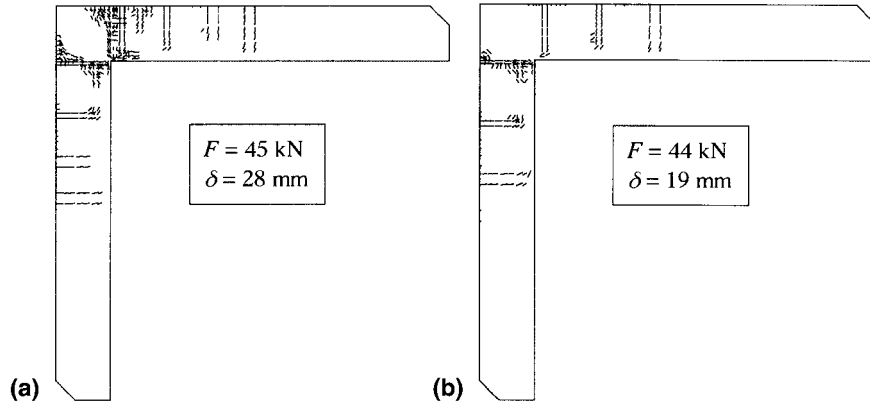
Crack Pattern at End of Analyses for Frame Corner with New Reinforcement Detailing When Assuming Two Bond Conditions: (a) Good; (b) Other
